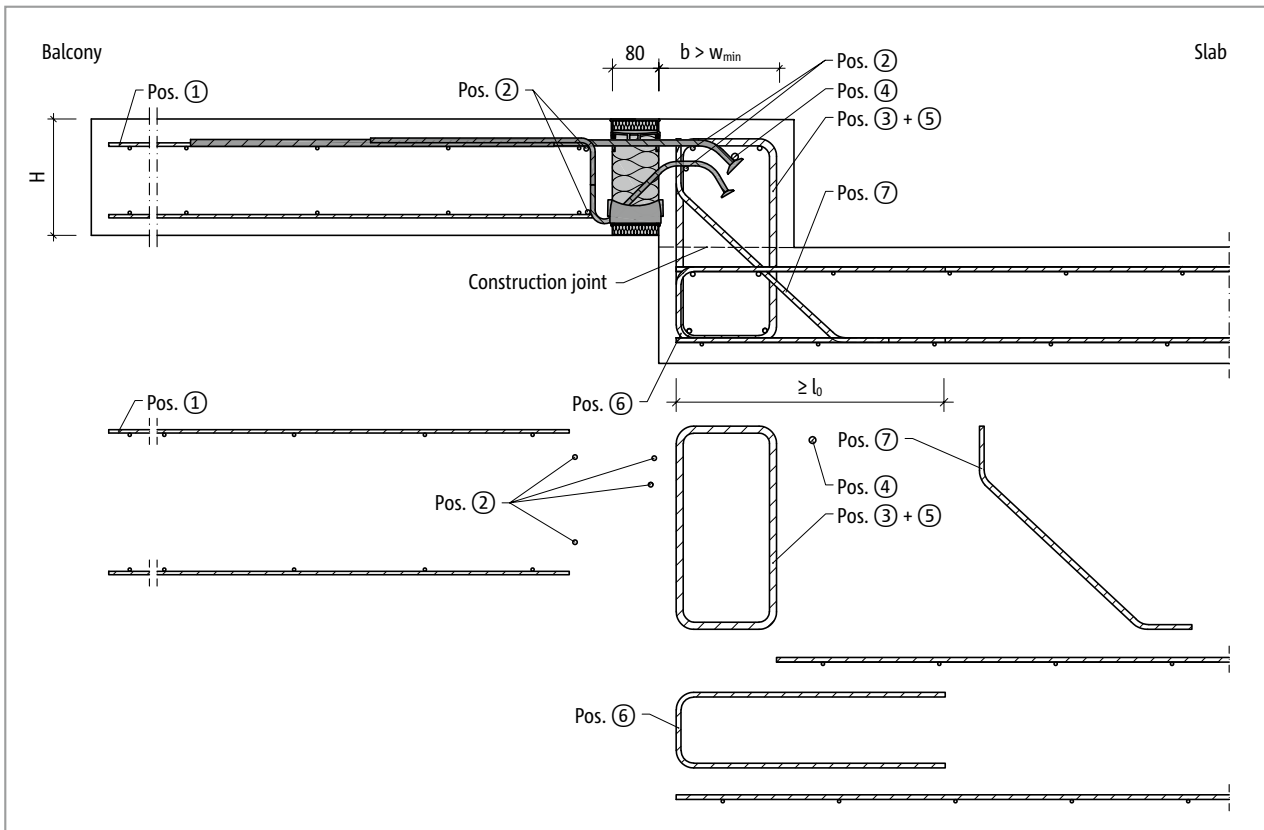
Schöck Isokorb® T type K-O-F: On-site reinforcement for balcony with height offset upwards with larger structural element dimension ($w_{exist} \geq w_{min}$)
